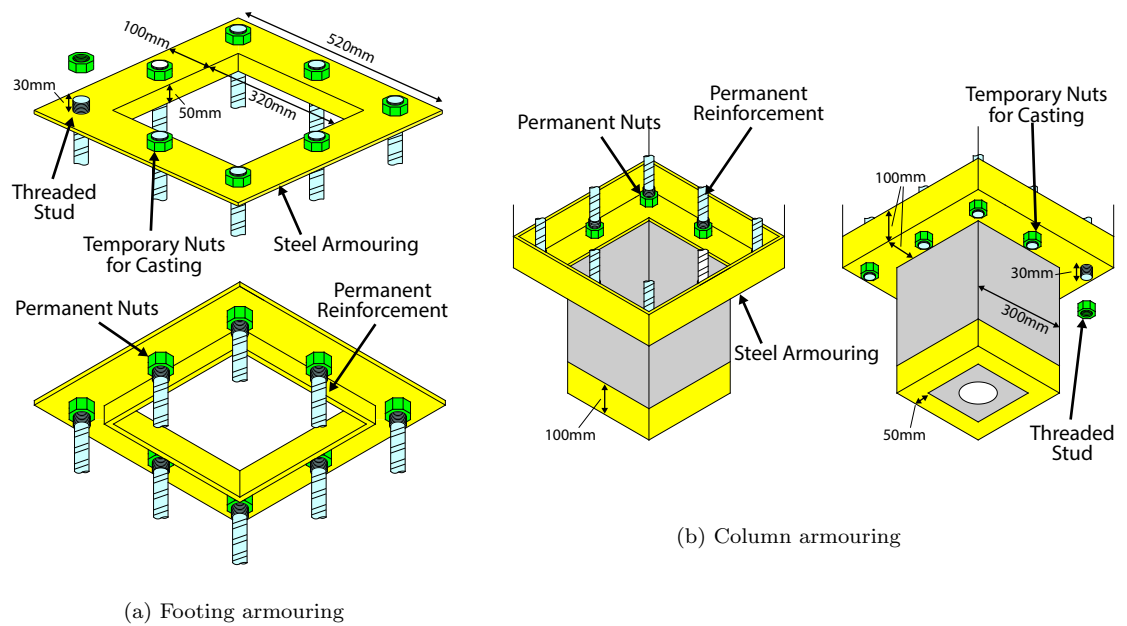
Armouring and nuts used to position reinforcement while precasting
